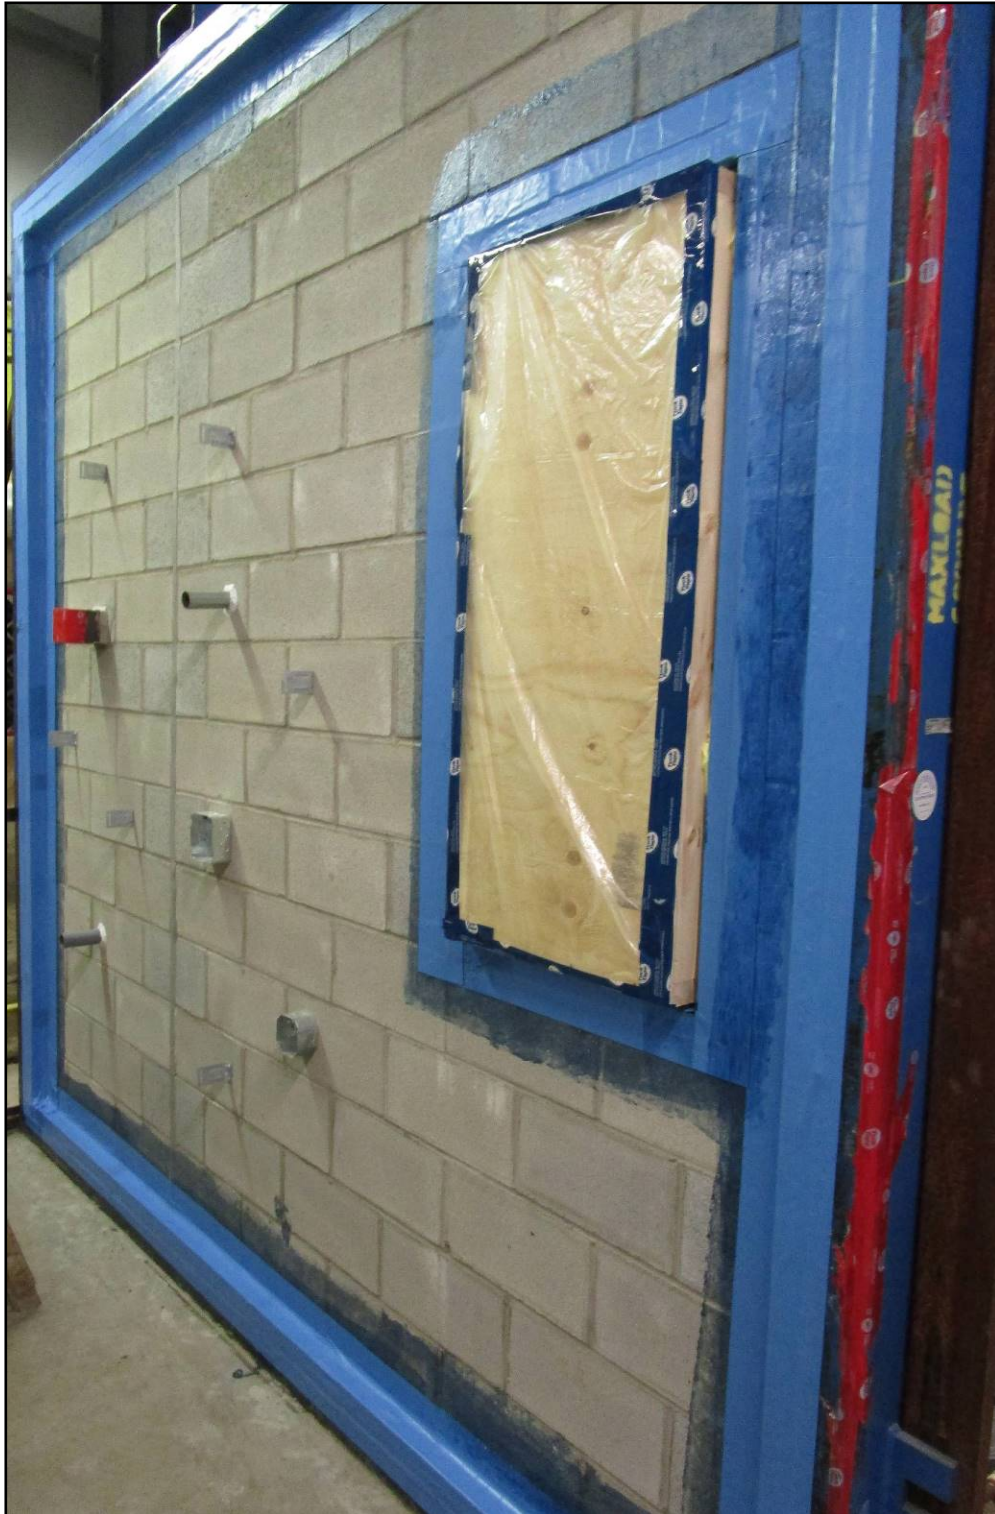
Penetrations wall section; wall perimeter and window rough open prepared with membrane and penetrations sealed with sealant prior to product application
